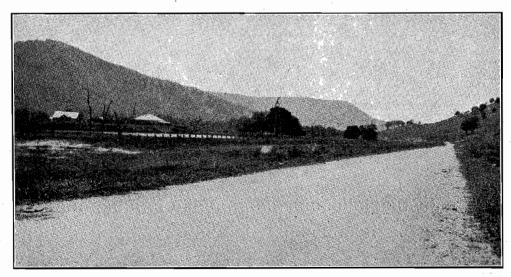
Section of Murray Valley Highway constructed in the Shire of Towong, East of Walwa.
